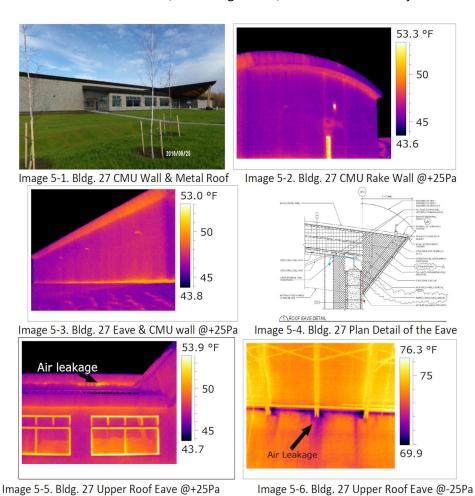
The tightest building examples; Bldg. 27, IR and plan details.
